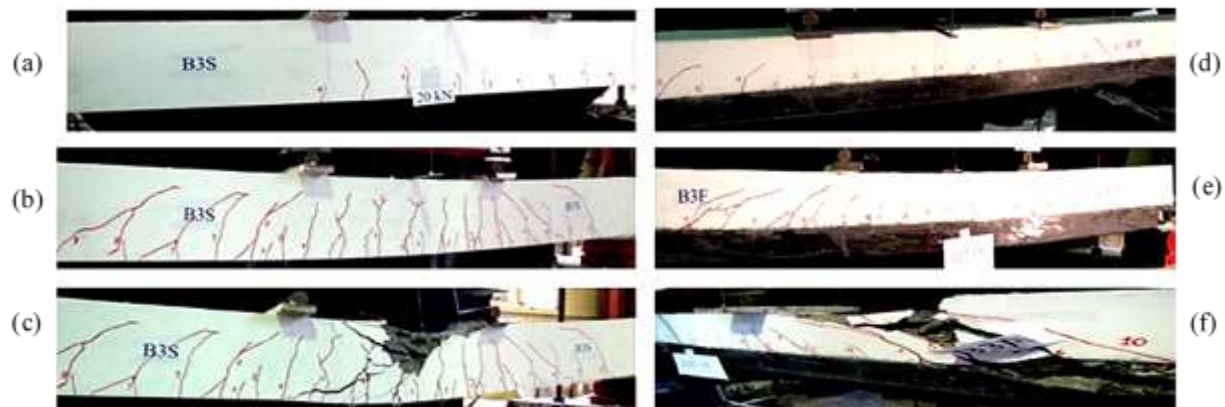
Cracking and failure sequence of Group III beam specimens (a) Beam B3S at initial cracking (b) Beam B3S at ultimate stage (c) Beam B3S at failure (d) Beam B3F after initial cracking and prior to yielding stage (e) Beam B3F at ultimate stage (f) Beam B3F after failure
